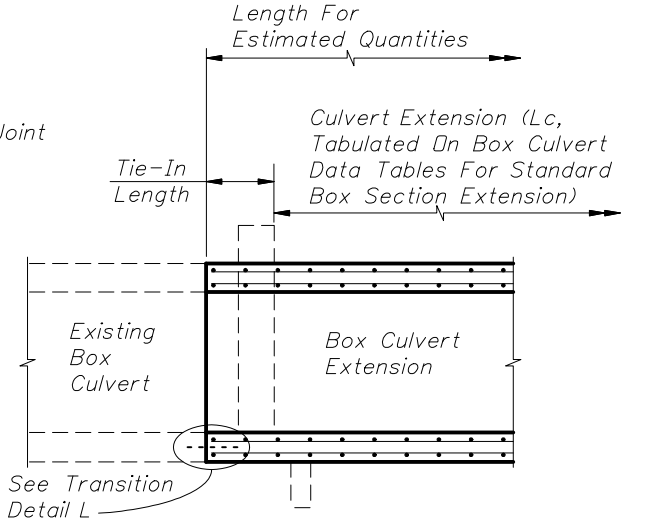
DETAIL "M" - TRANSITION FOR INTERIOR DOUBLE WALLS OF BOX CULVERTS
